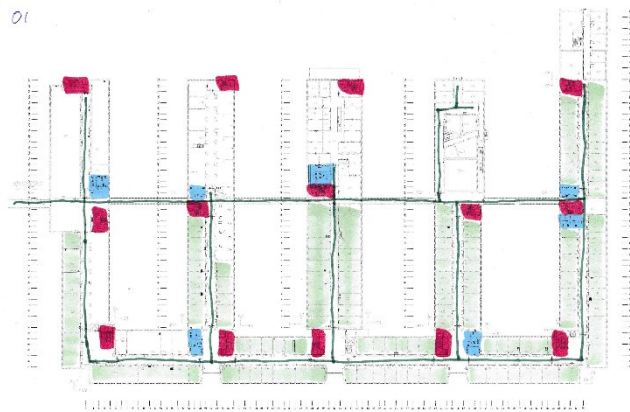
Second floor (Red: Stairwells, Blue: Toilets, Green: Repetitive office structure)
